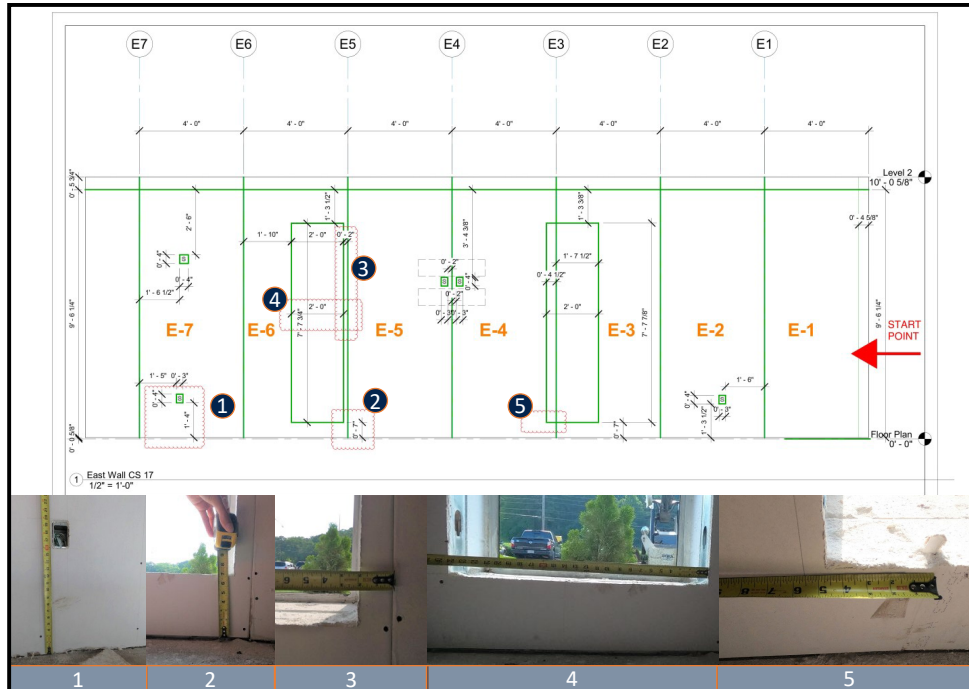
Dimensional Verification of East Wall Cut Sheets for Drywall Installation
